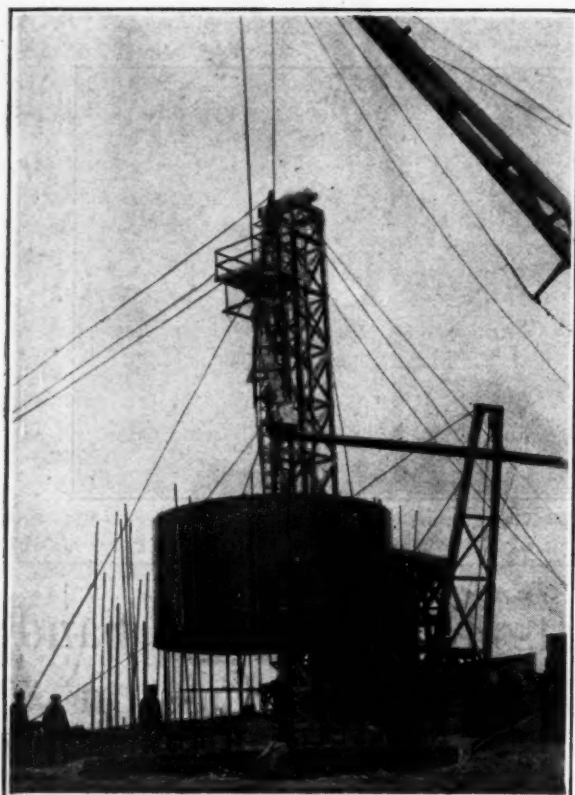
PLACING INSIDE FORM AT AUXILIARY SHAFT
